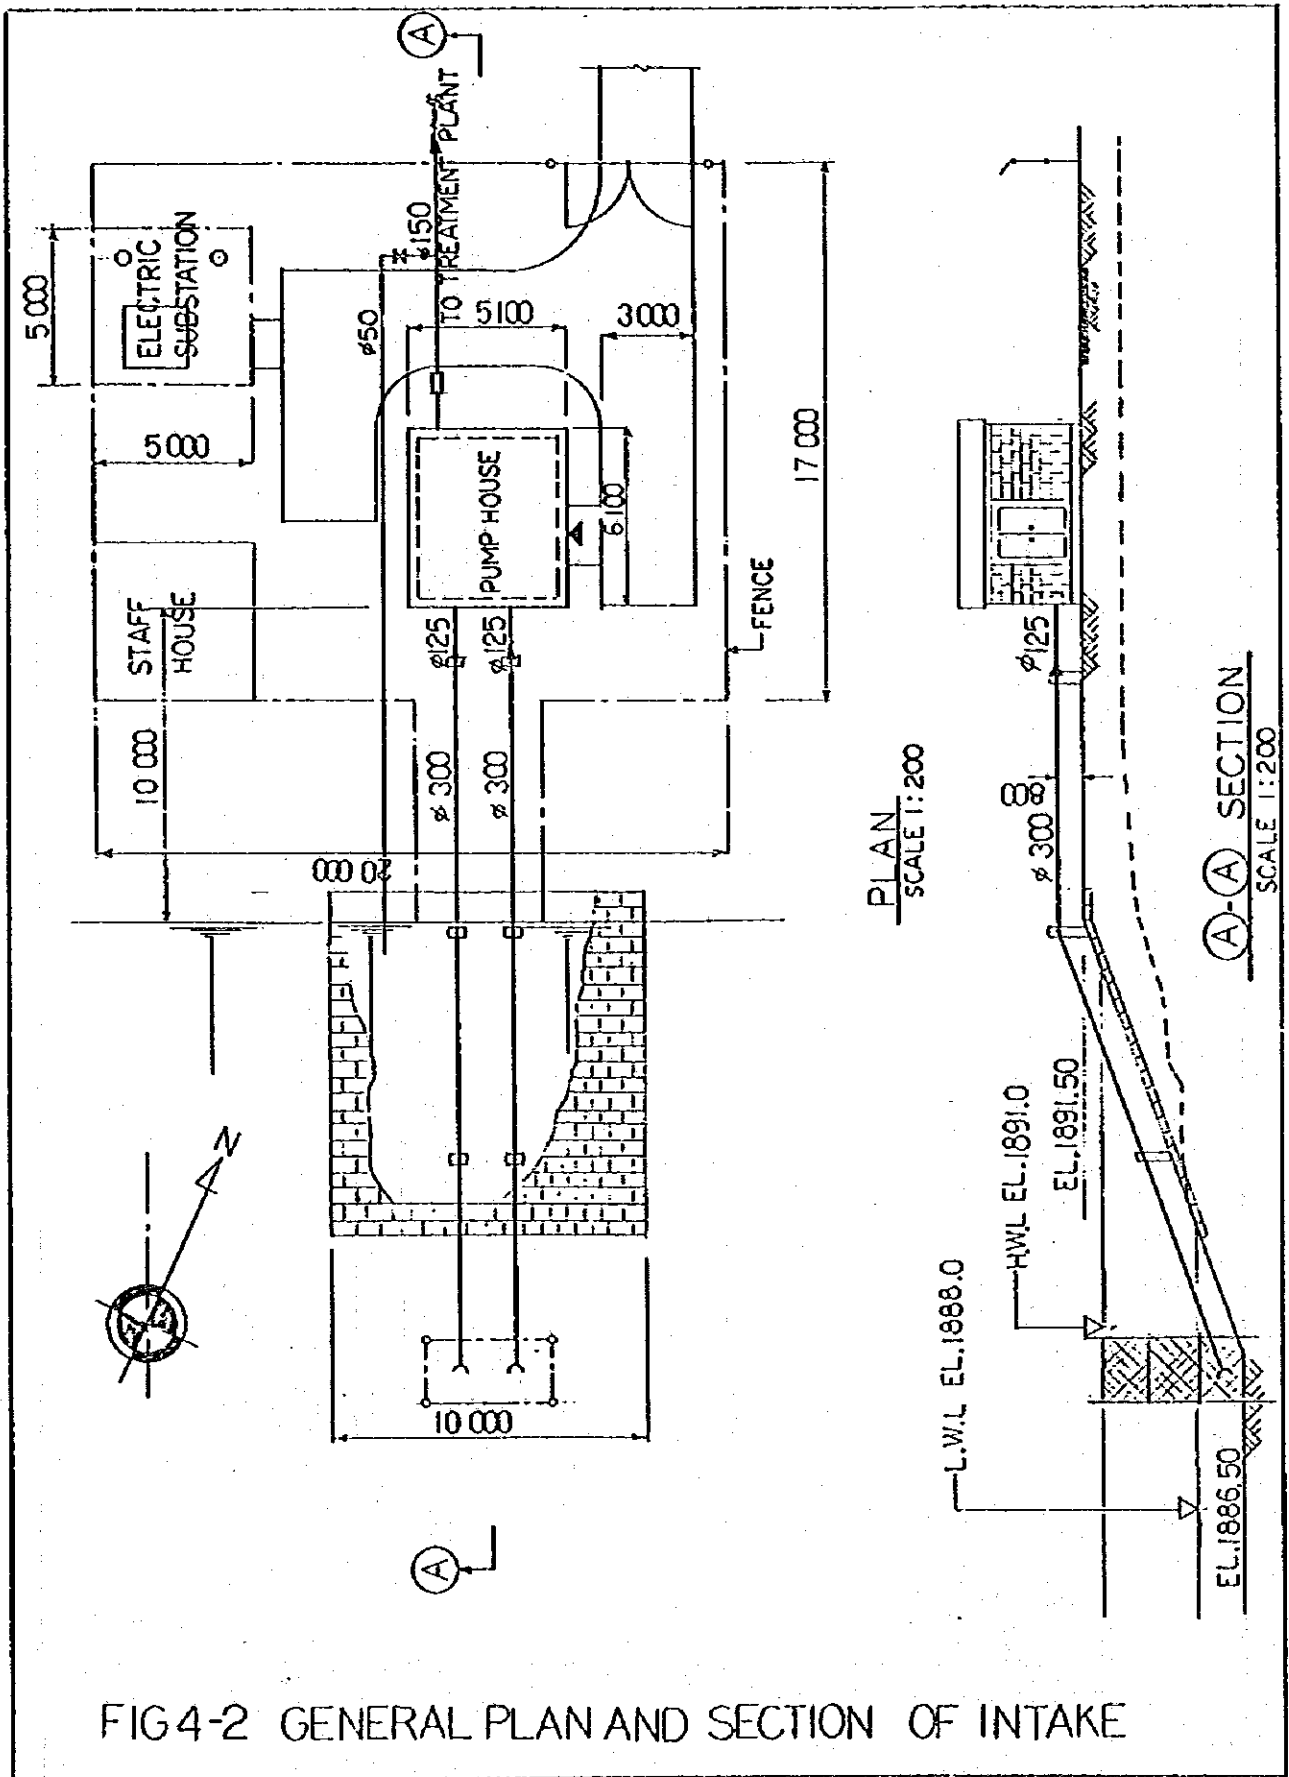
GENERAL PLAN AND SECTION OF INTAKE
